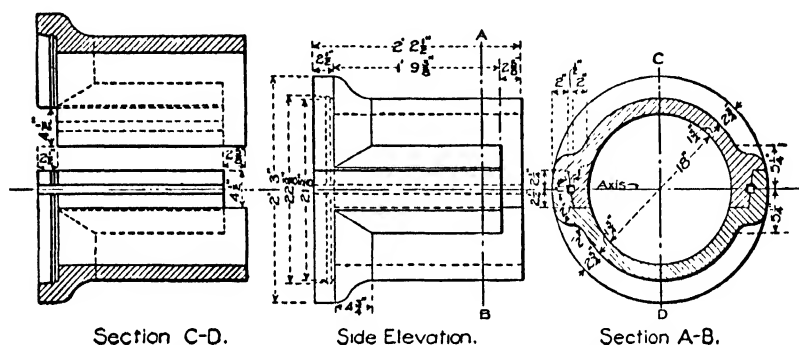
k*.—Sectional Concrete Casing for Timber Piles.
